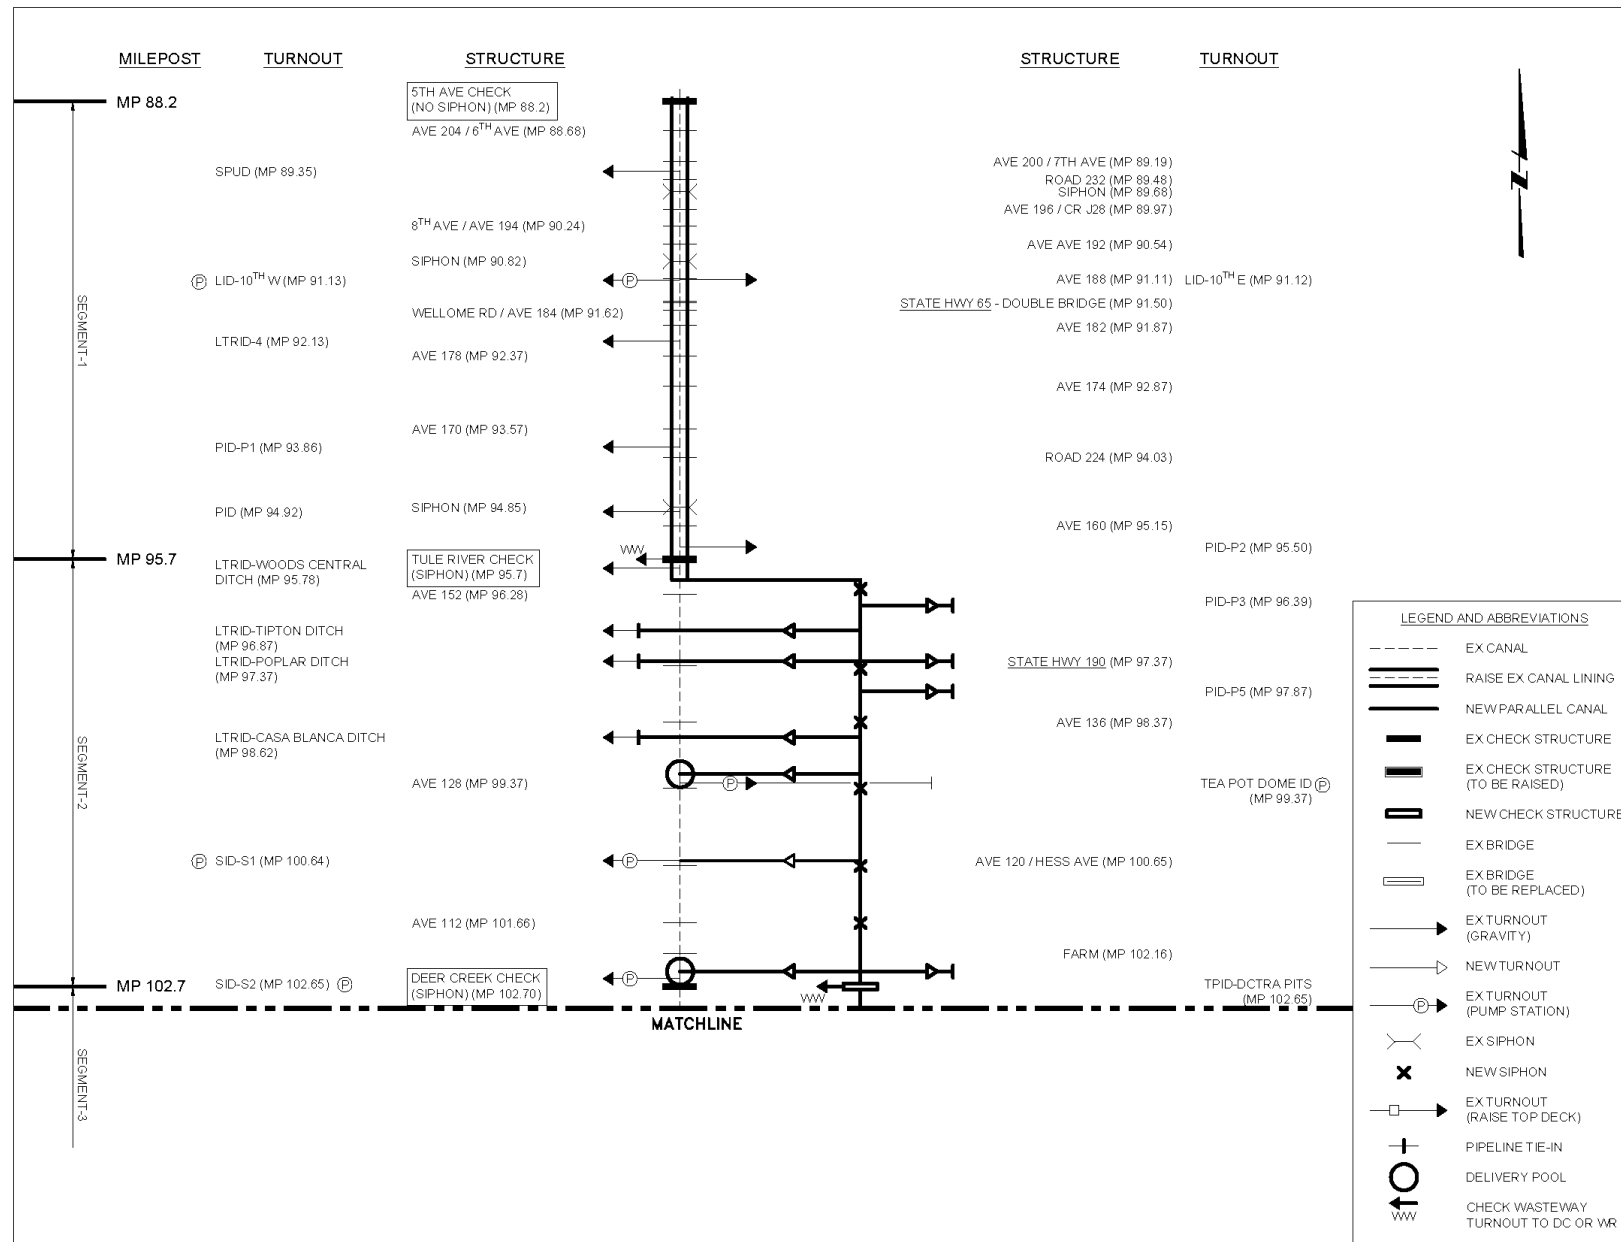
A. Recommended Plan Single-Line Diagram of Canal Segments 1 and 2
